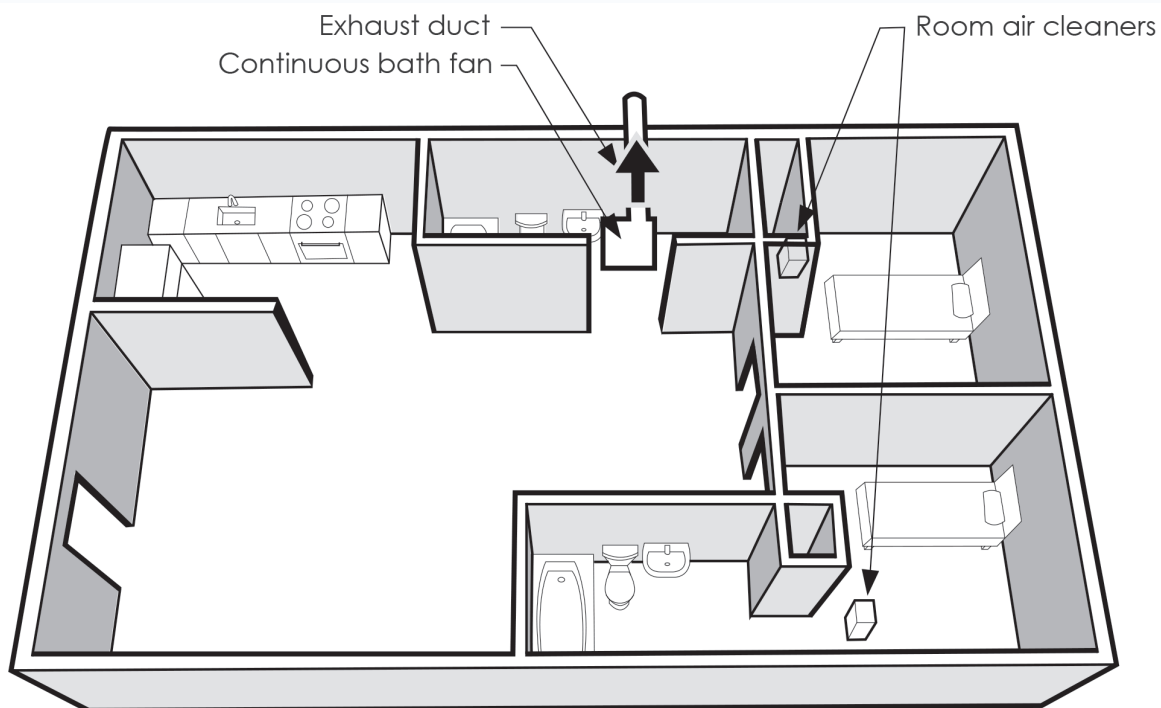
Exhaust-Only Ventilation in the Bathroom, and Room Air Cleaners
